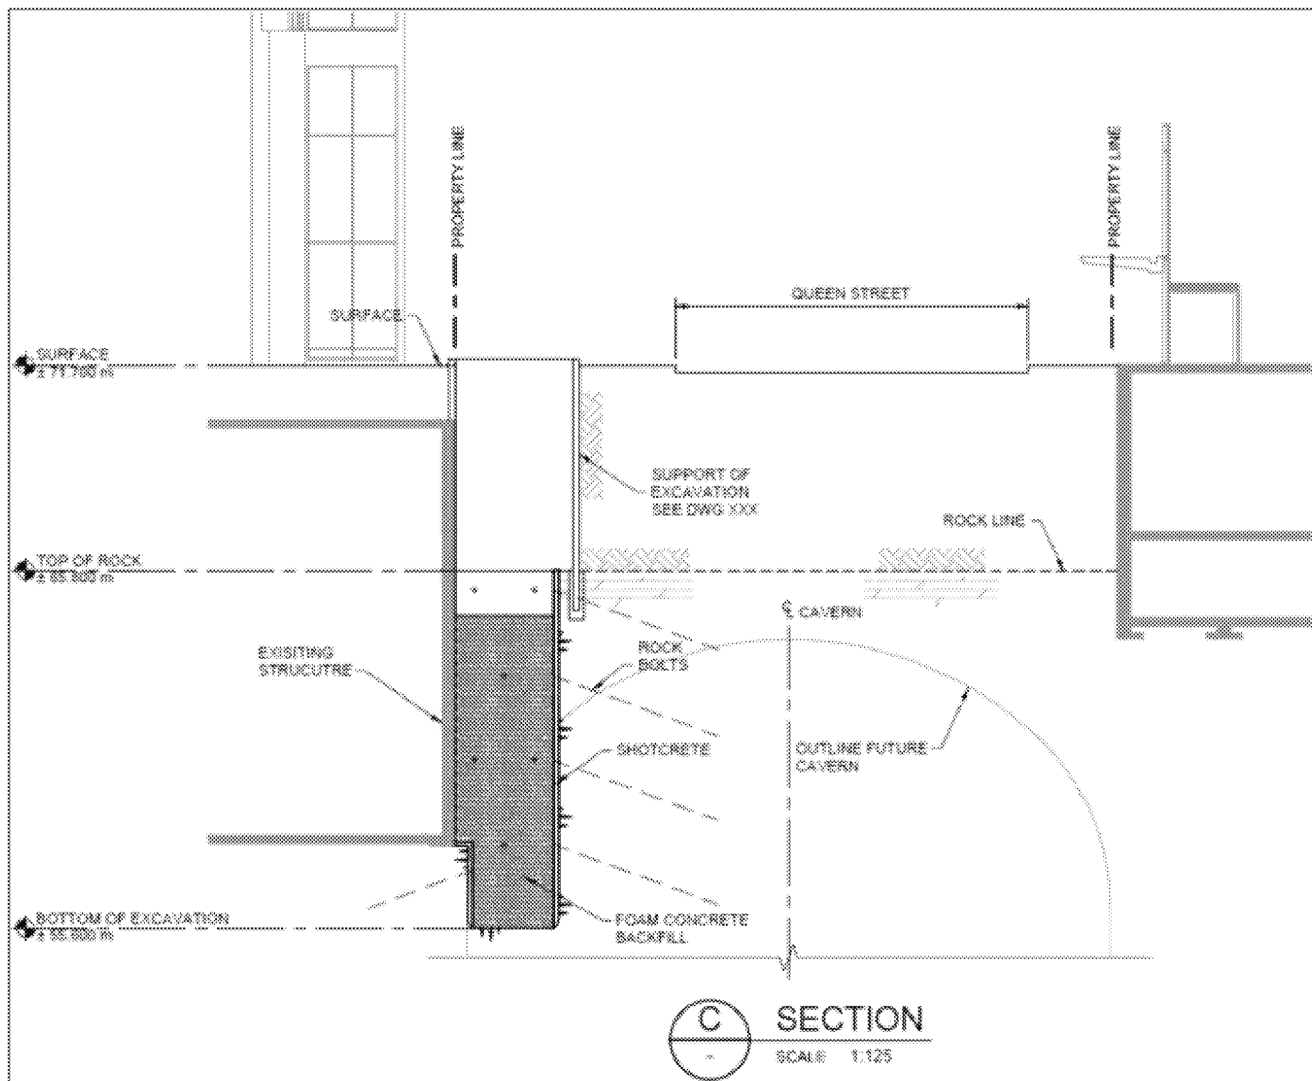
shows the Downtown East – East Entry Shaft proposed construction.
